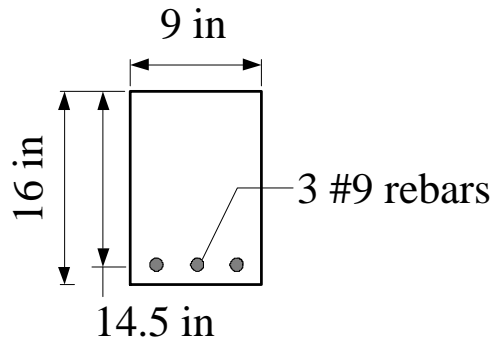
Section dimension and arrangement of longitudinal reinforcement steel rebar for section UHP/St60 16R-3
